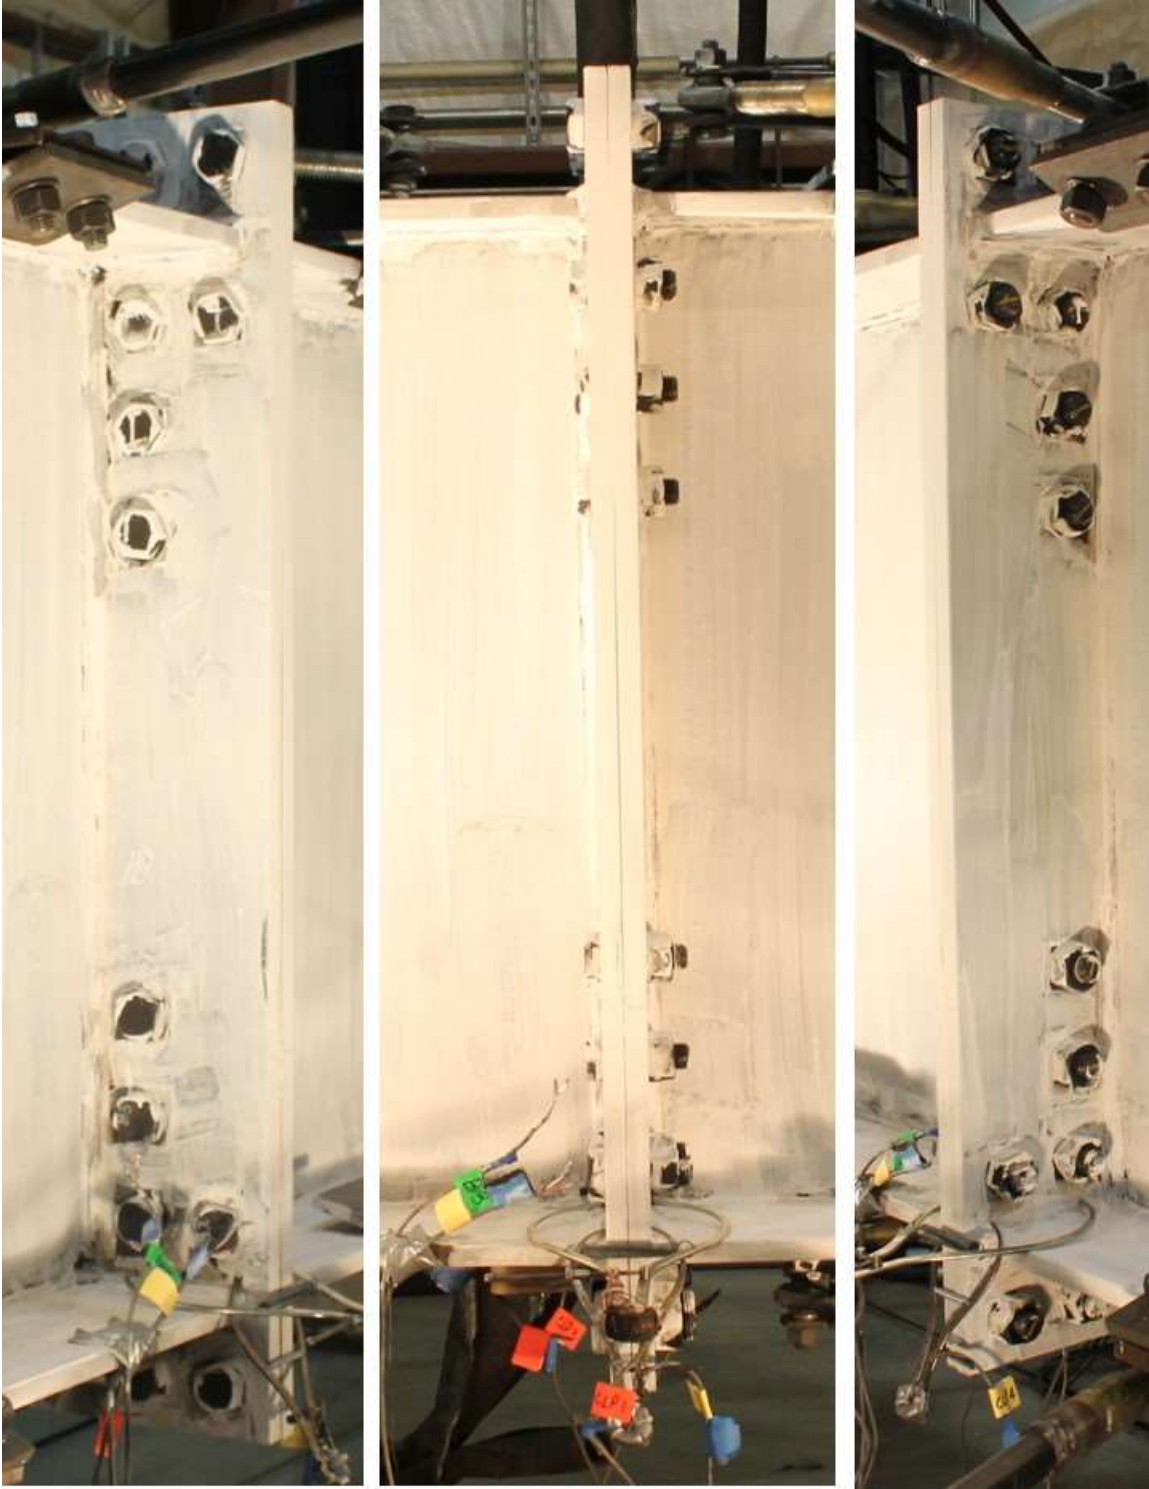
Three views of the Specimen 12B-MRE 1/3-4W/2W-1.00-0.75-36 at the start of the test
